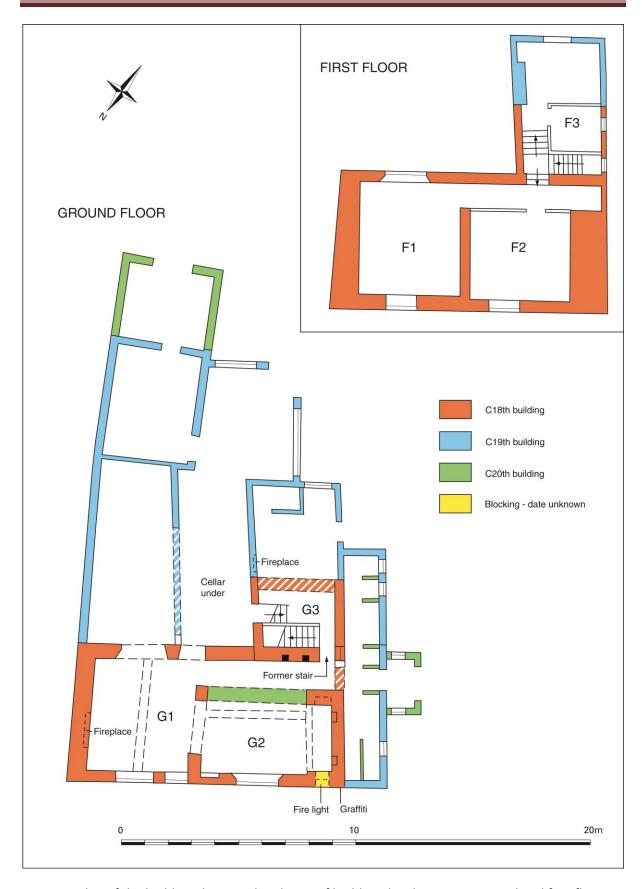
Plan of the building showing the phases of building development. Ground and first floor, location of cellar indicated (Andy Isham).
